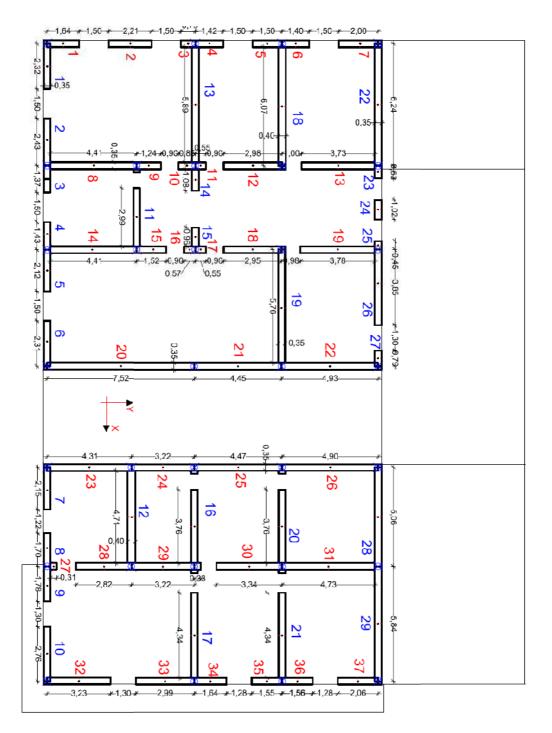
Structural Plan ET"A". Second Floor (+11.85).
